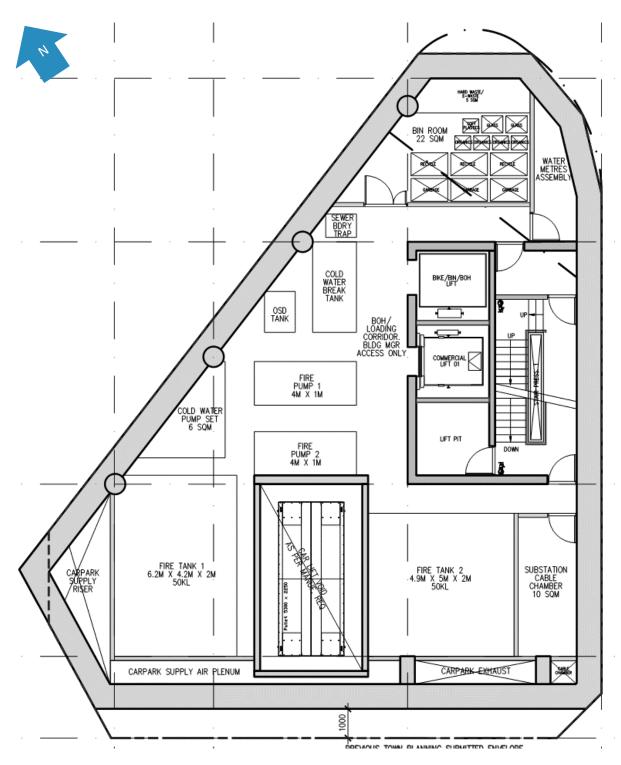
Proposed Floor Plans – Basement 1 (Image Source: Elenberg Fraser)
